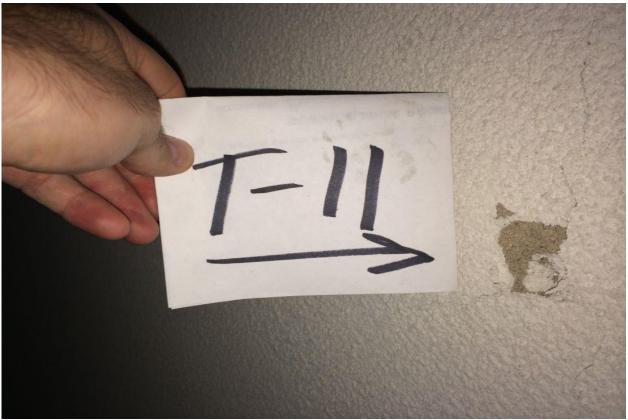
Laboratory analyses detected 20% chrysotile asbestos within spray on surfacing material sample TS-11 collected from the Theatre Building upstairs projection room ceiling.
